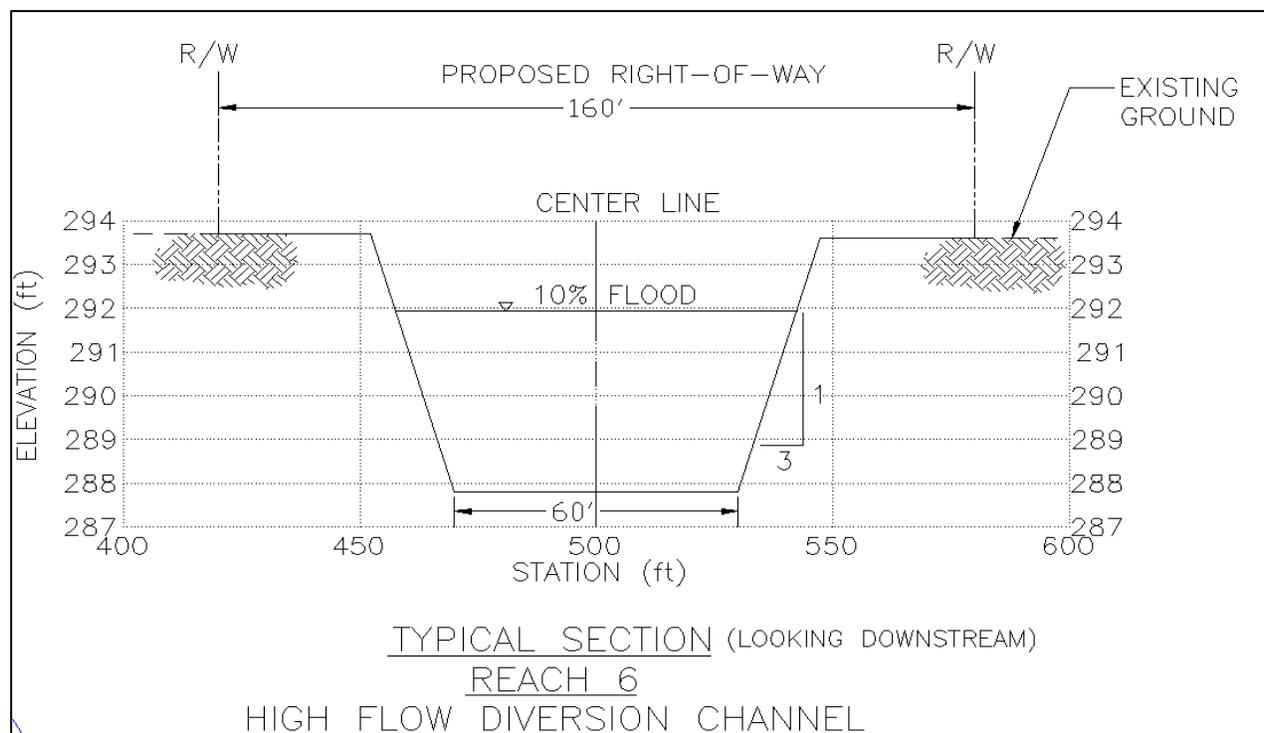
Bypass Channel Typical Cross-Section Reach 6
